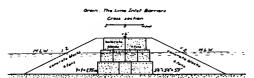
Cross section of groin, the Lime Inlet Barriers.
